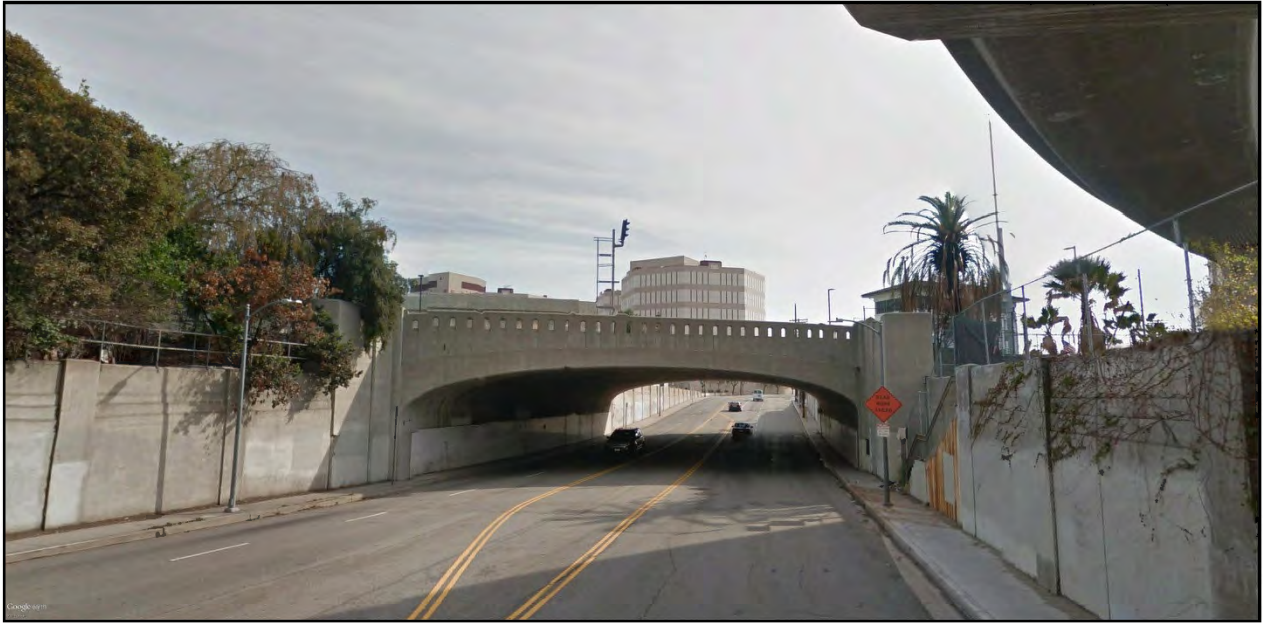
Key View #2b – Vignes Street Bridge (view looking east toward bridge)
